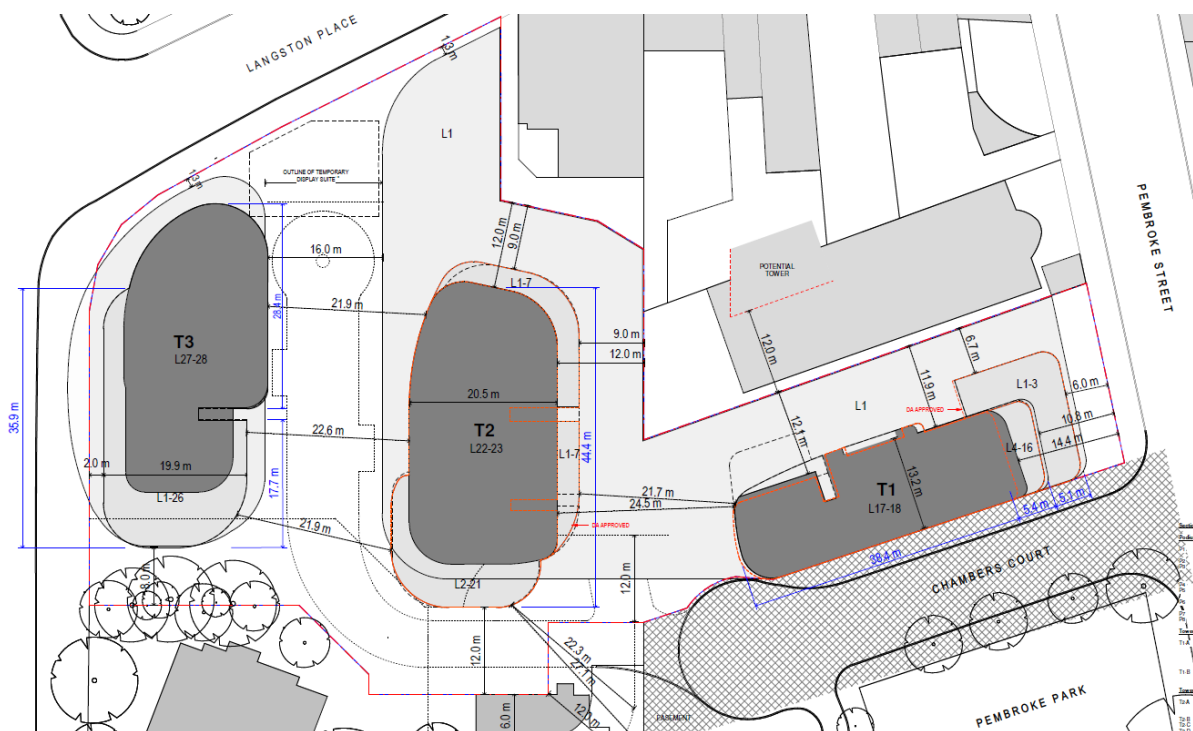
Site plan showing location of towers 1, 2 & 3 (T1, T2, T3) including separation distances.
